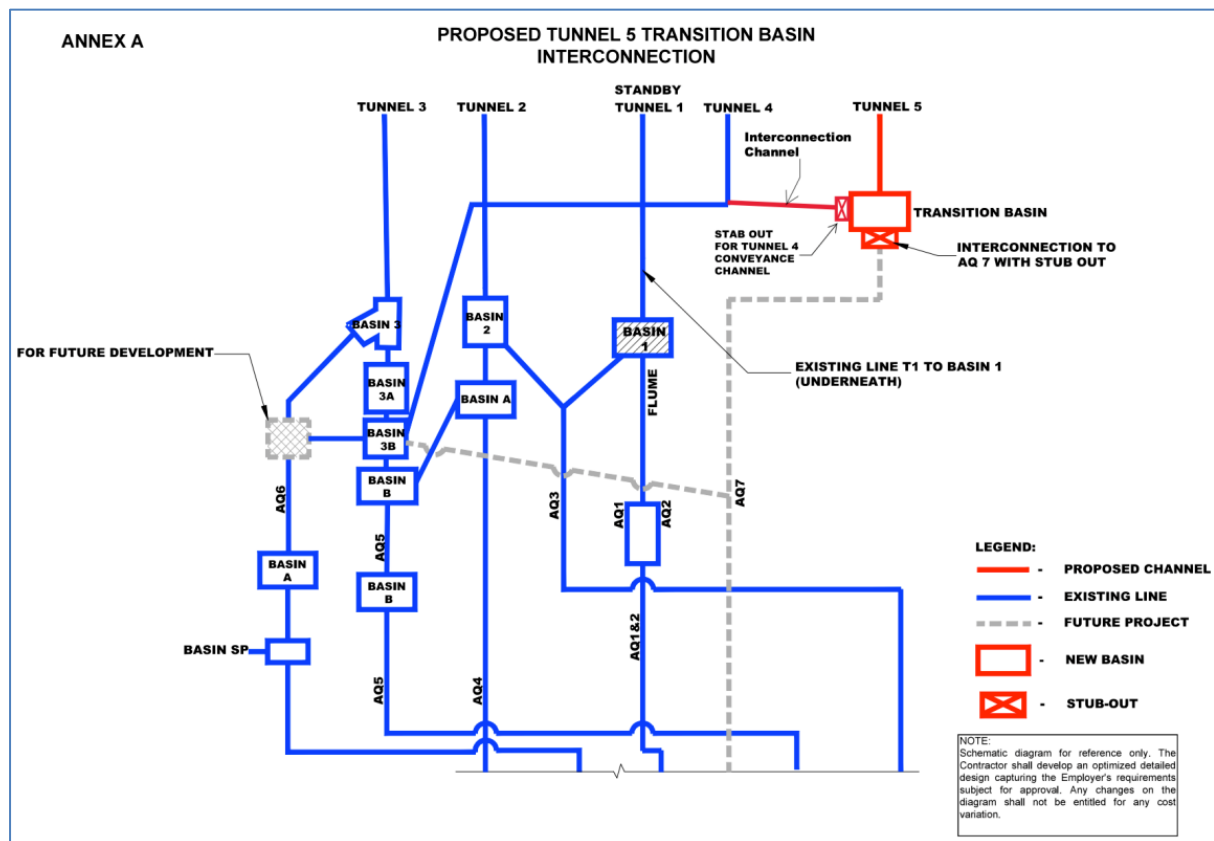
Proposed Intersection Tunnel 5 and AQ-7
